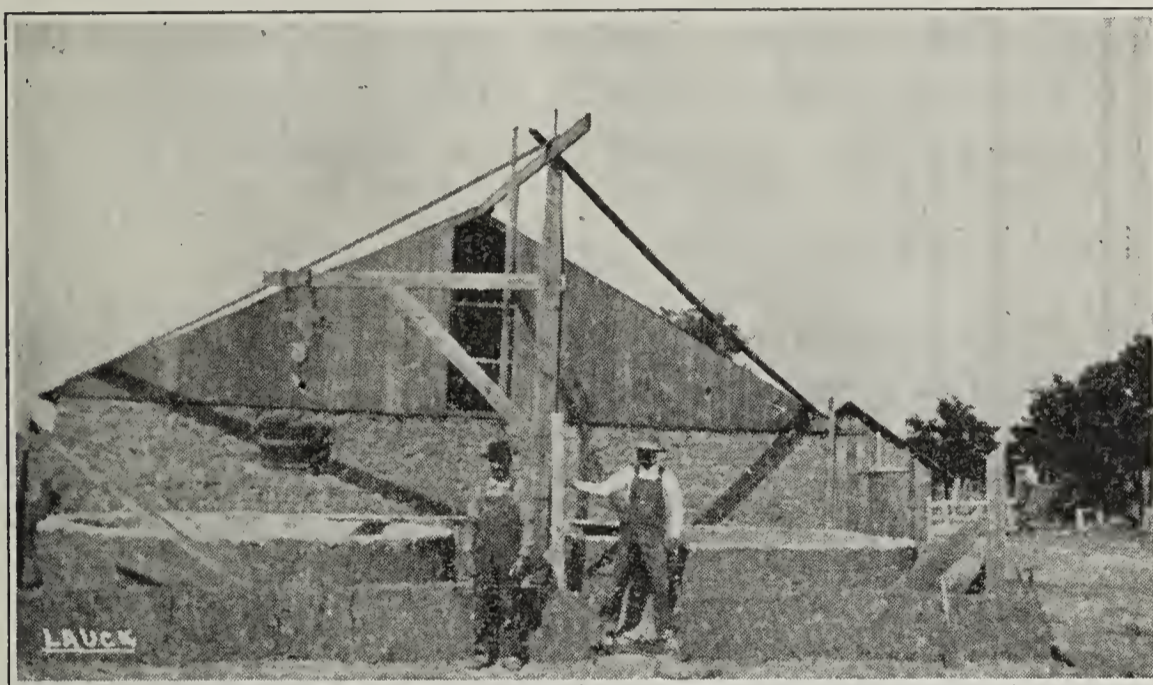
Fig. II. Two pit silos on the Plains Substation Farm at Cheyenne Wells, built by Superintendent J. W. Adams. Note the plaster on the adobe walls, the hoist for elevating dirt and silage, and the half-barrel bucket. This shows a desirable location of silos. (Photo by Lauck.)
